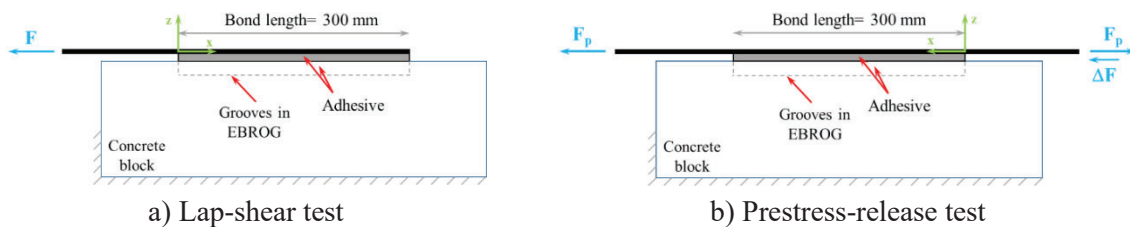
Layout examples of possible tests on FRP strips glued to concrete
